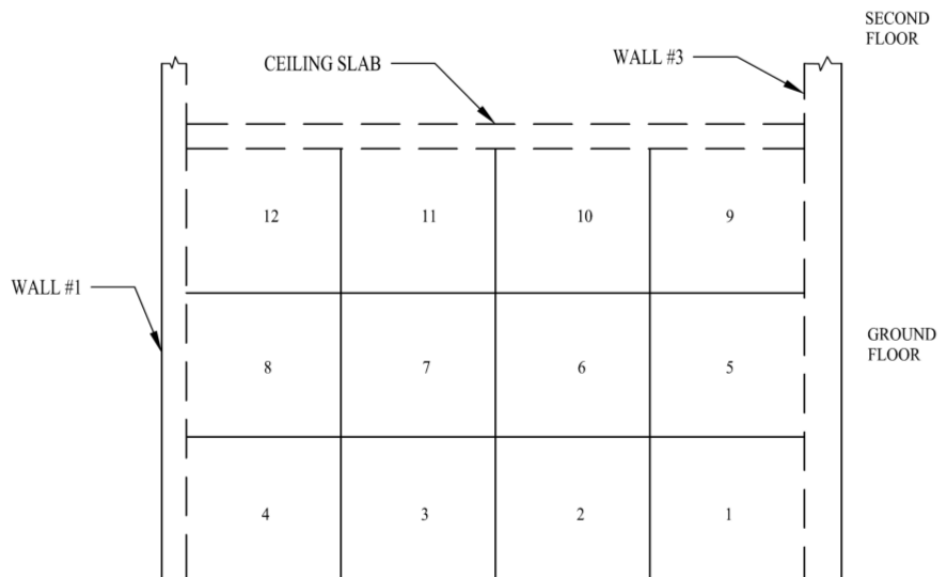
Loading boxes for Wall #2, outside of blast chamber looking in.
